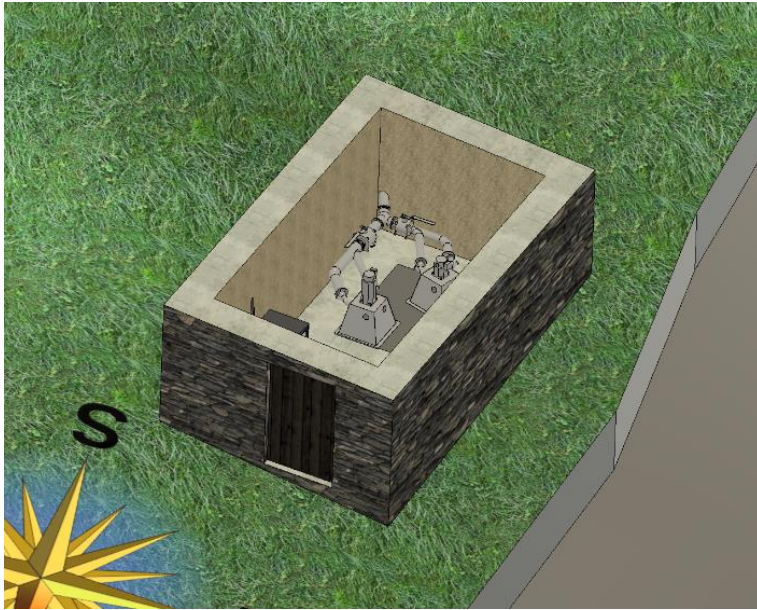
Internal layout showing normal and dry weather turbines. The tailrace duct runs out to the river bank from the sump below the turbines.
